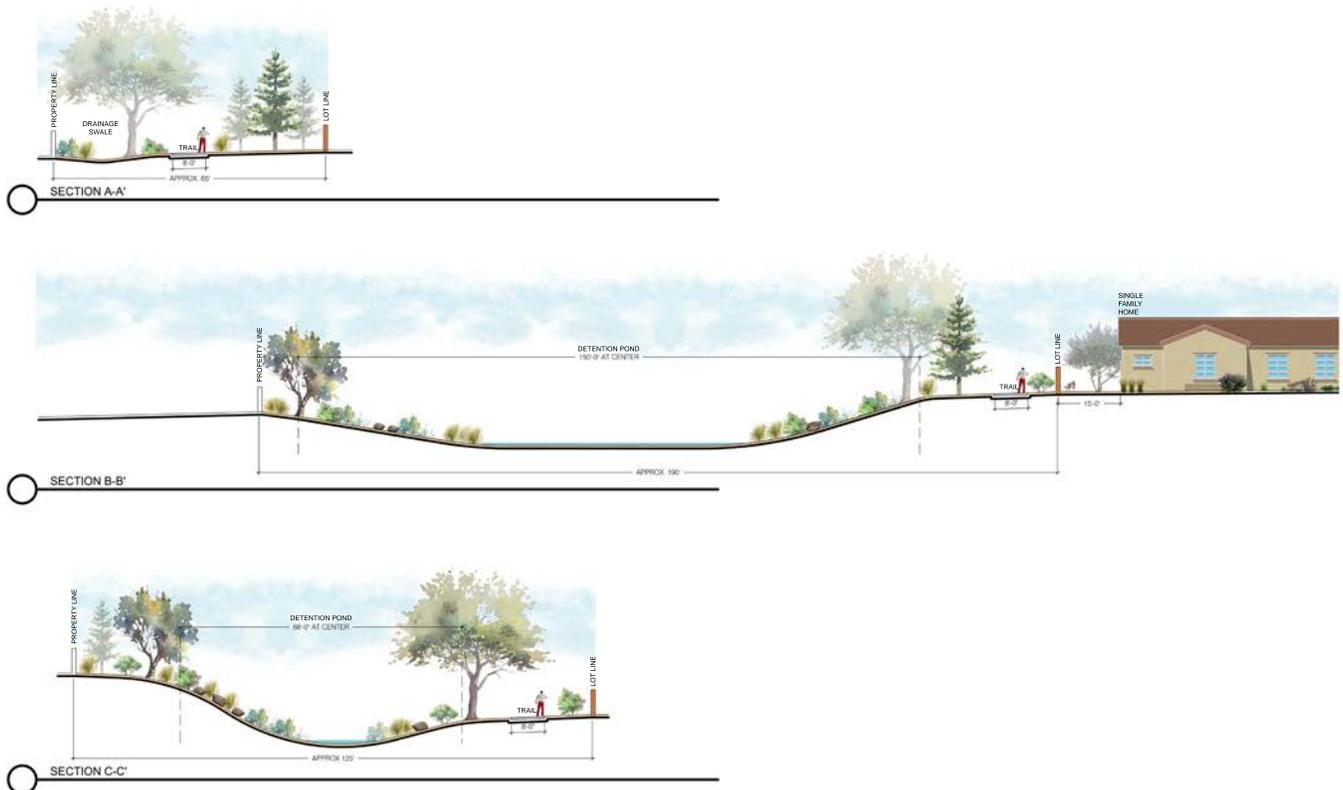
PROPOSED BUFFER CROSS SECTIONS
